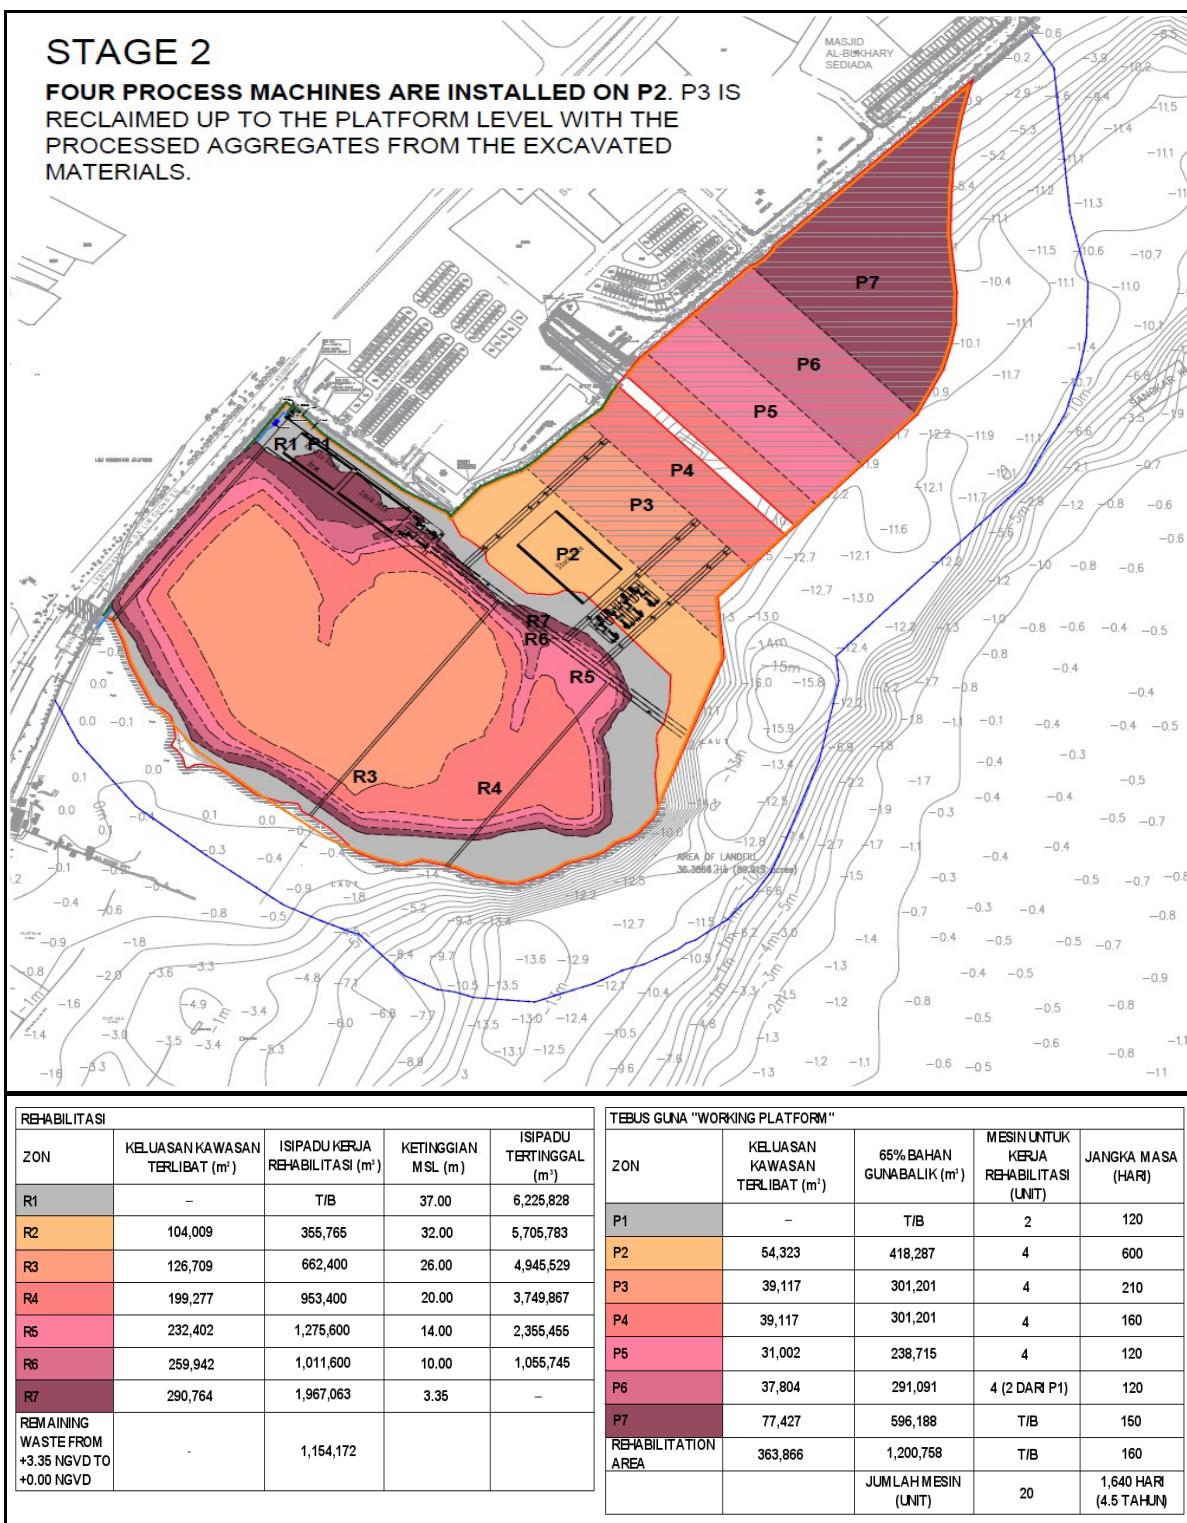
Layout Plan For Stage 2 Recycling Area On Jelutong Landfill
